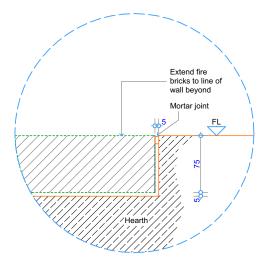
Cross Section Fire Surround Opt. 5 Timber Cavity
